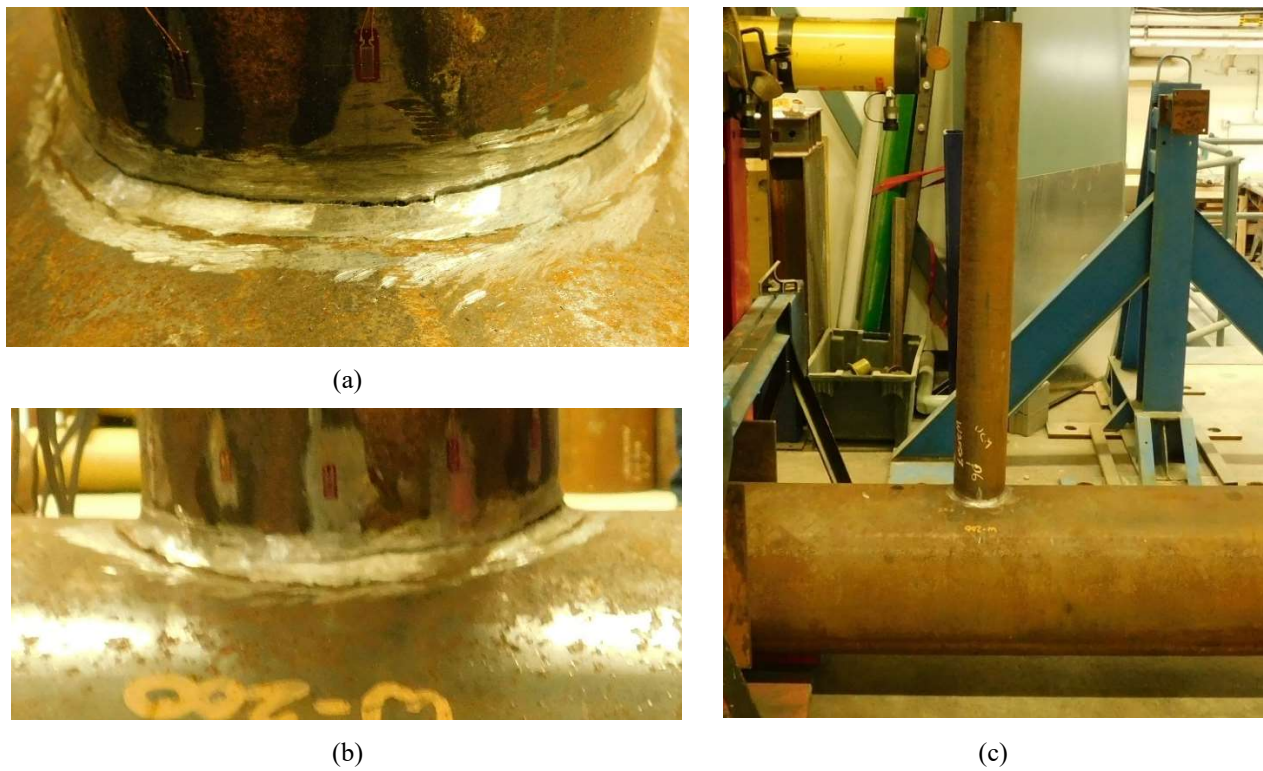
Failure of T406-127-0.7 (a) weld fracture, (b) chord deformation and (c) branch deformation
